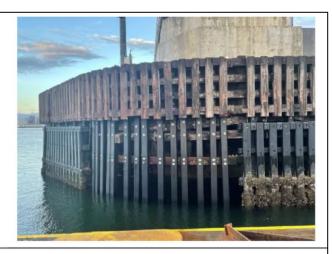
View of Pier W3 (12/2024) repairs due to storm damage.
